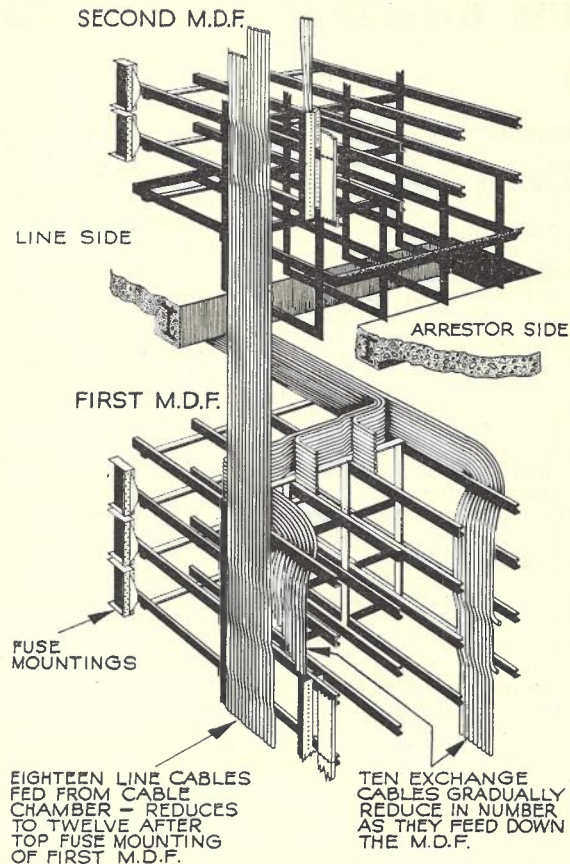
Portion of Multiple M.D.F. Indicating Cable Arrangements.
